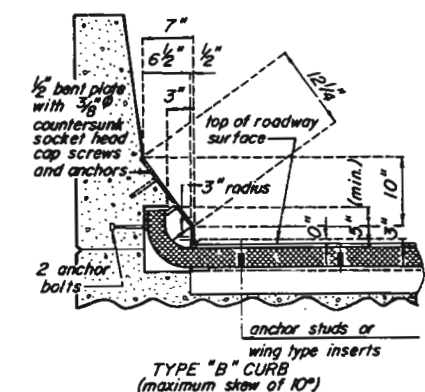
DETAILS OF ELASTOMERIC EXPANSION JOINT SEAL
